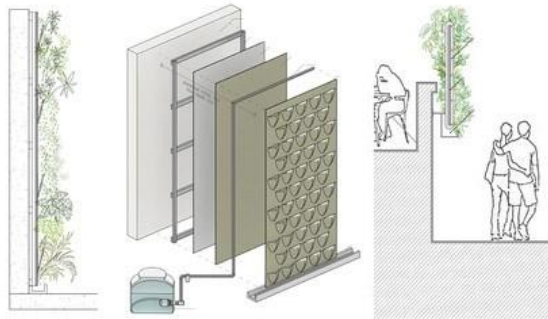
Example planting facade. Source: Muro Verde / Jardin Vertical [from authors private archive]
